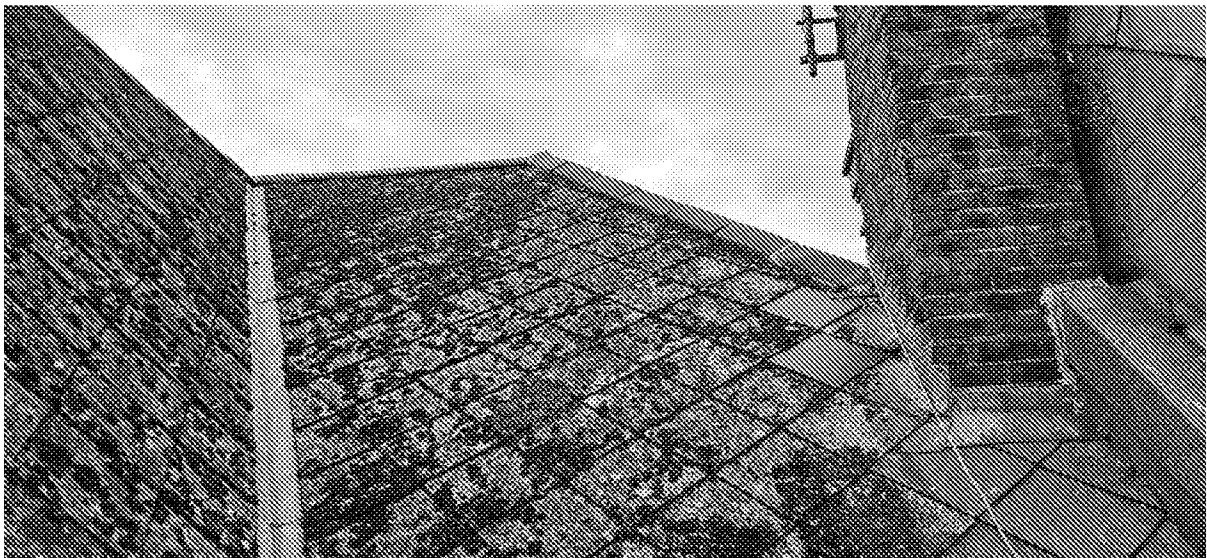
Northwest main roof showing flat fibre slate effect tiles with clay ridge tiles, noting gaps underneath hip and ridge tiles plus well sealed chimney flashing
